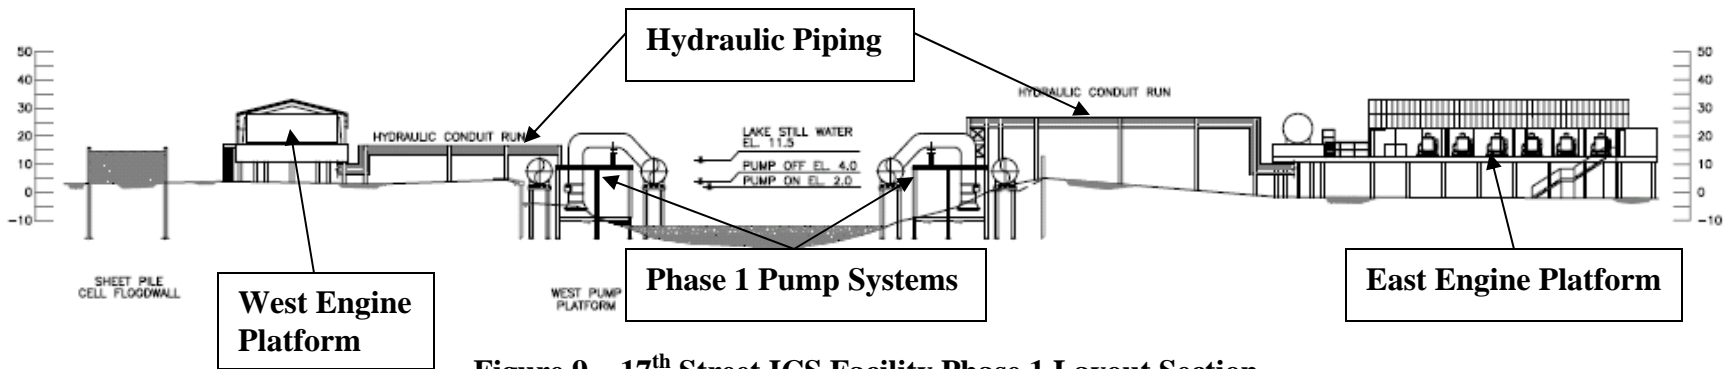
17th Street ICS Facility Phase 1 Layout Section
